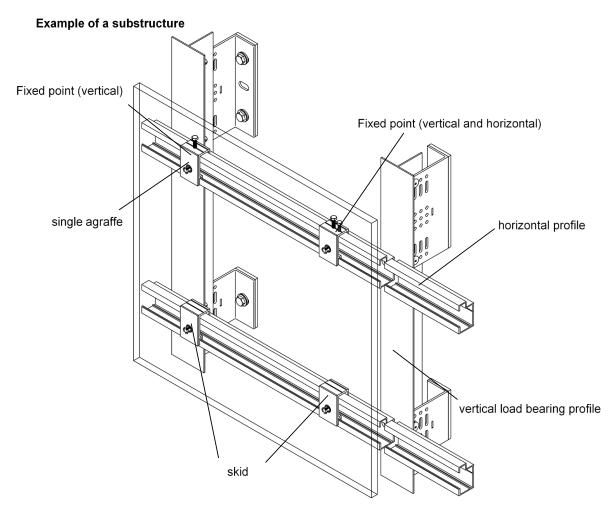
EXAMPLE FOR FAÇADE PANEL SUBSTRUCTURE INSTALLED WITH KEIL UNDERCUT ANCHORS KH
